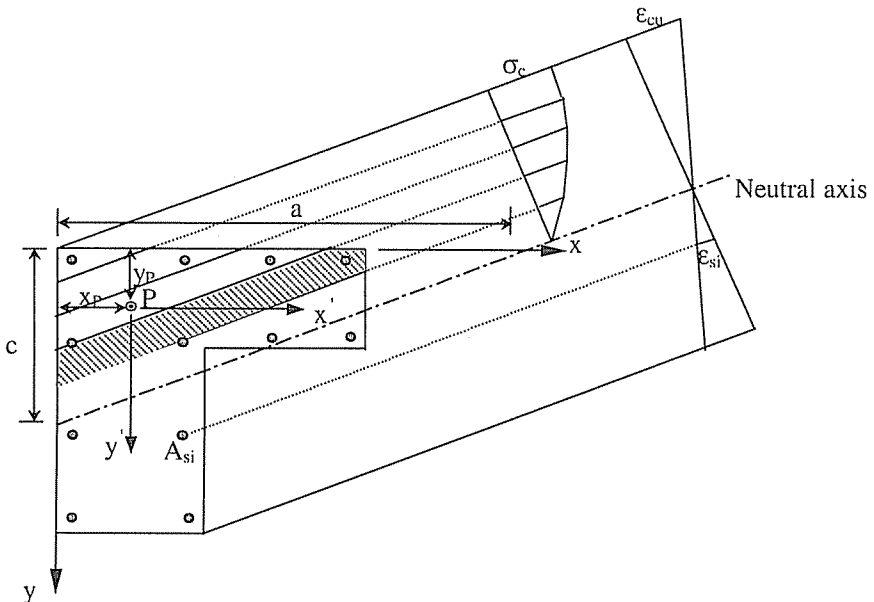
Stresses and strains in concrete section under biaxial bending and axial load
